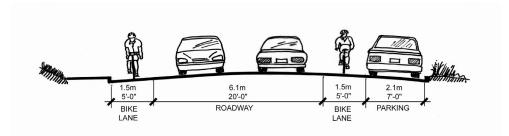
Proposed Development of Bay Area Ridge Trail Corridor at Washington Boulevard
